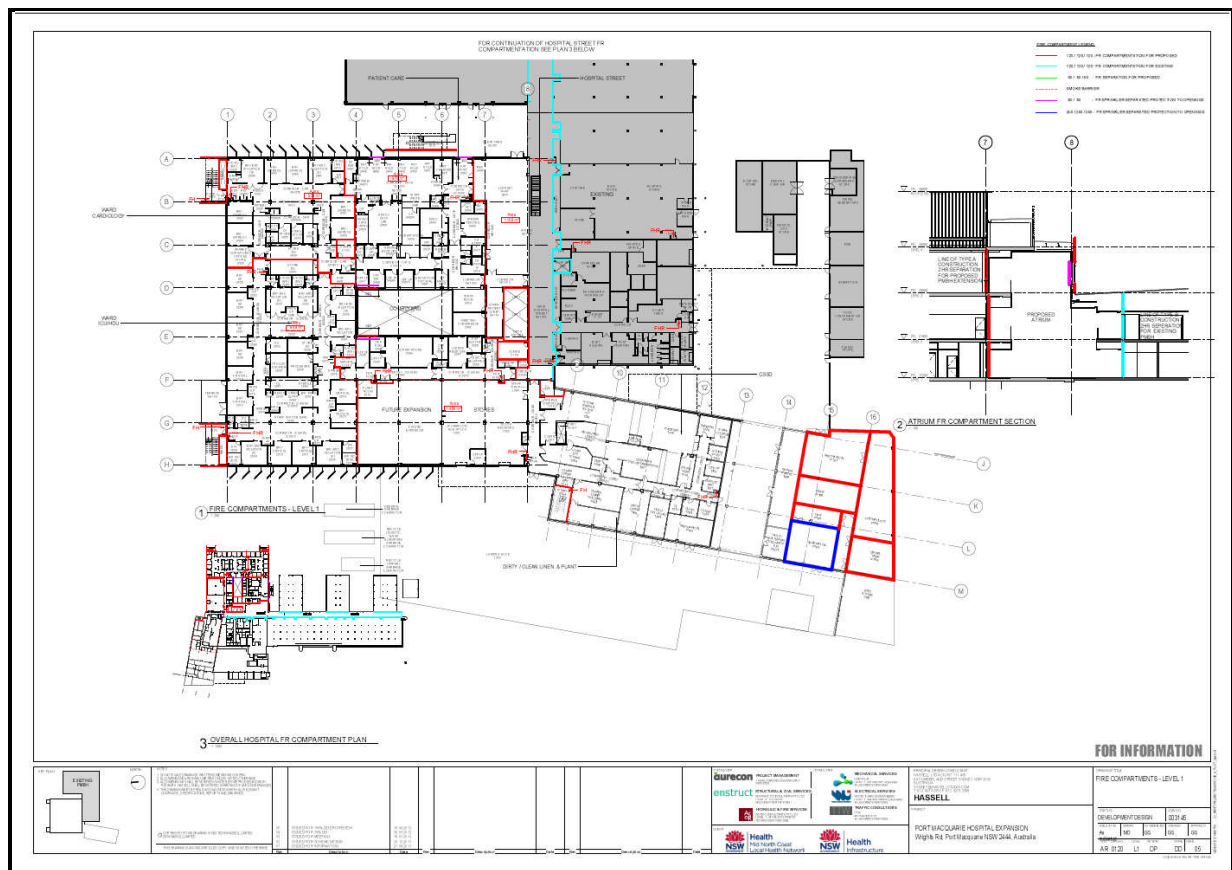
First Floor (Ground Level) floor plan identifying fire and smoke compartmentation and external required exits.
